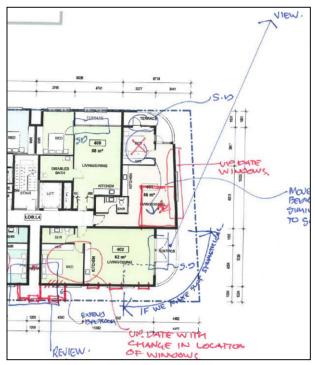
Extract of Sketch demonstrating testing of southeast corner terrace symmetry (Source: de Witt Consulting).
